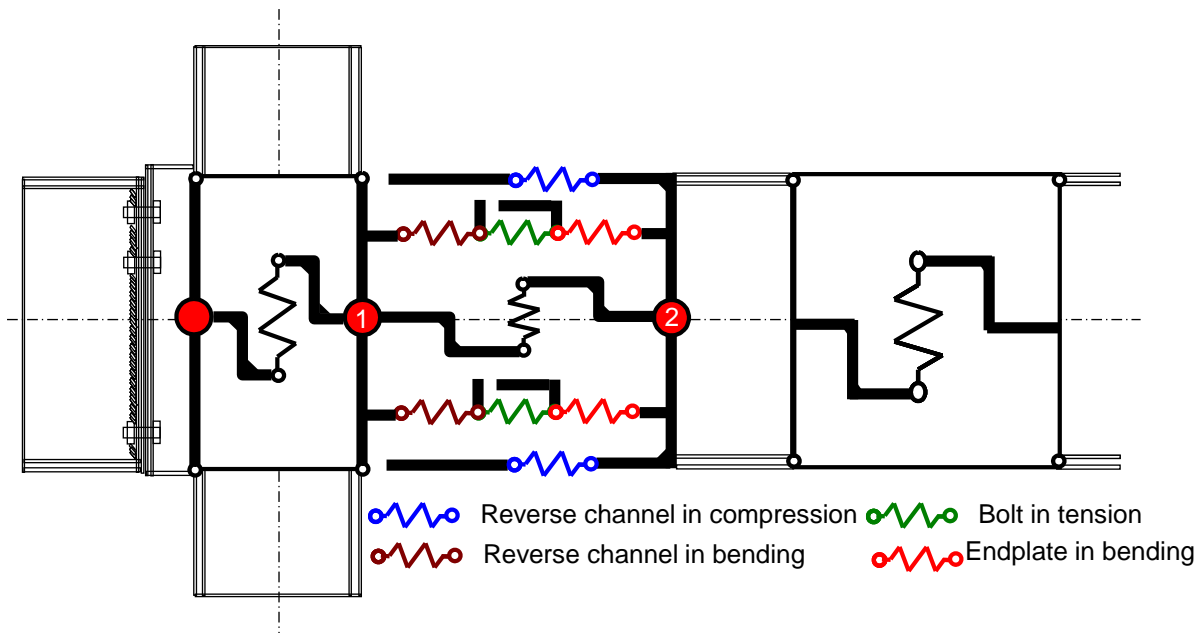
Component assembly and beam-end shear panel (Block, 2006)
